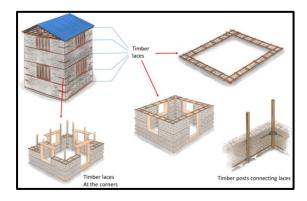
Improved Masonry Construction in district Gorkha, Nepal
